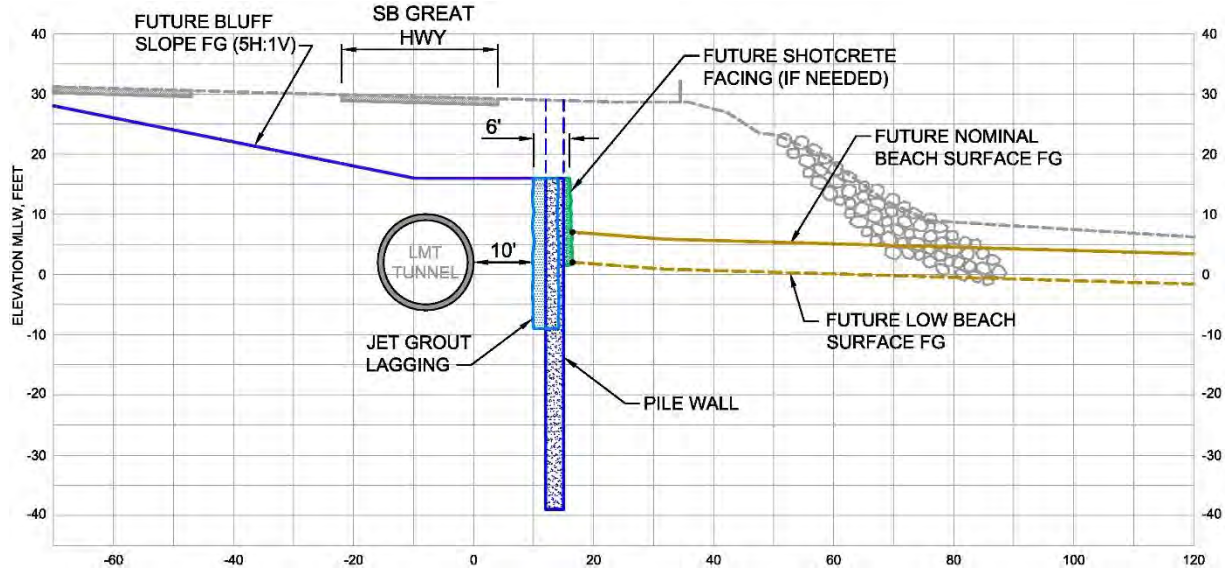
Typical Pile Wall Cross-Section (shown at EQR)
